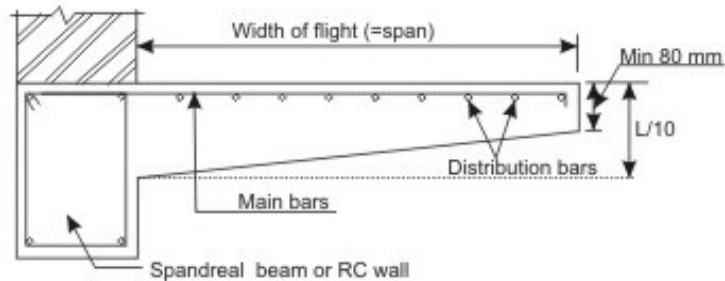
(b): Cantilever slab from a spandrel beam or wall
